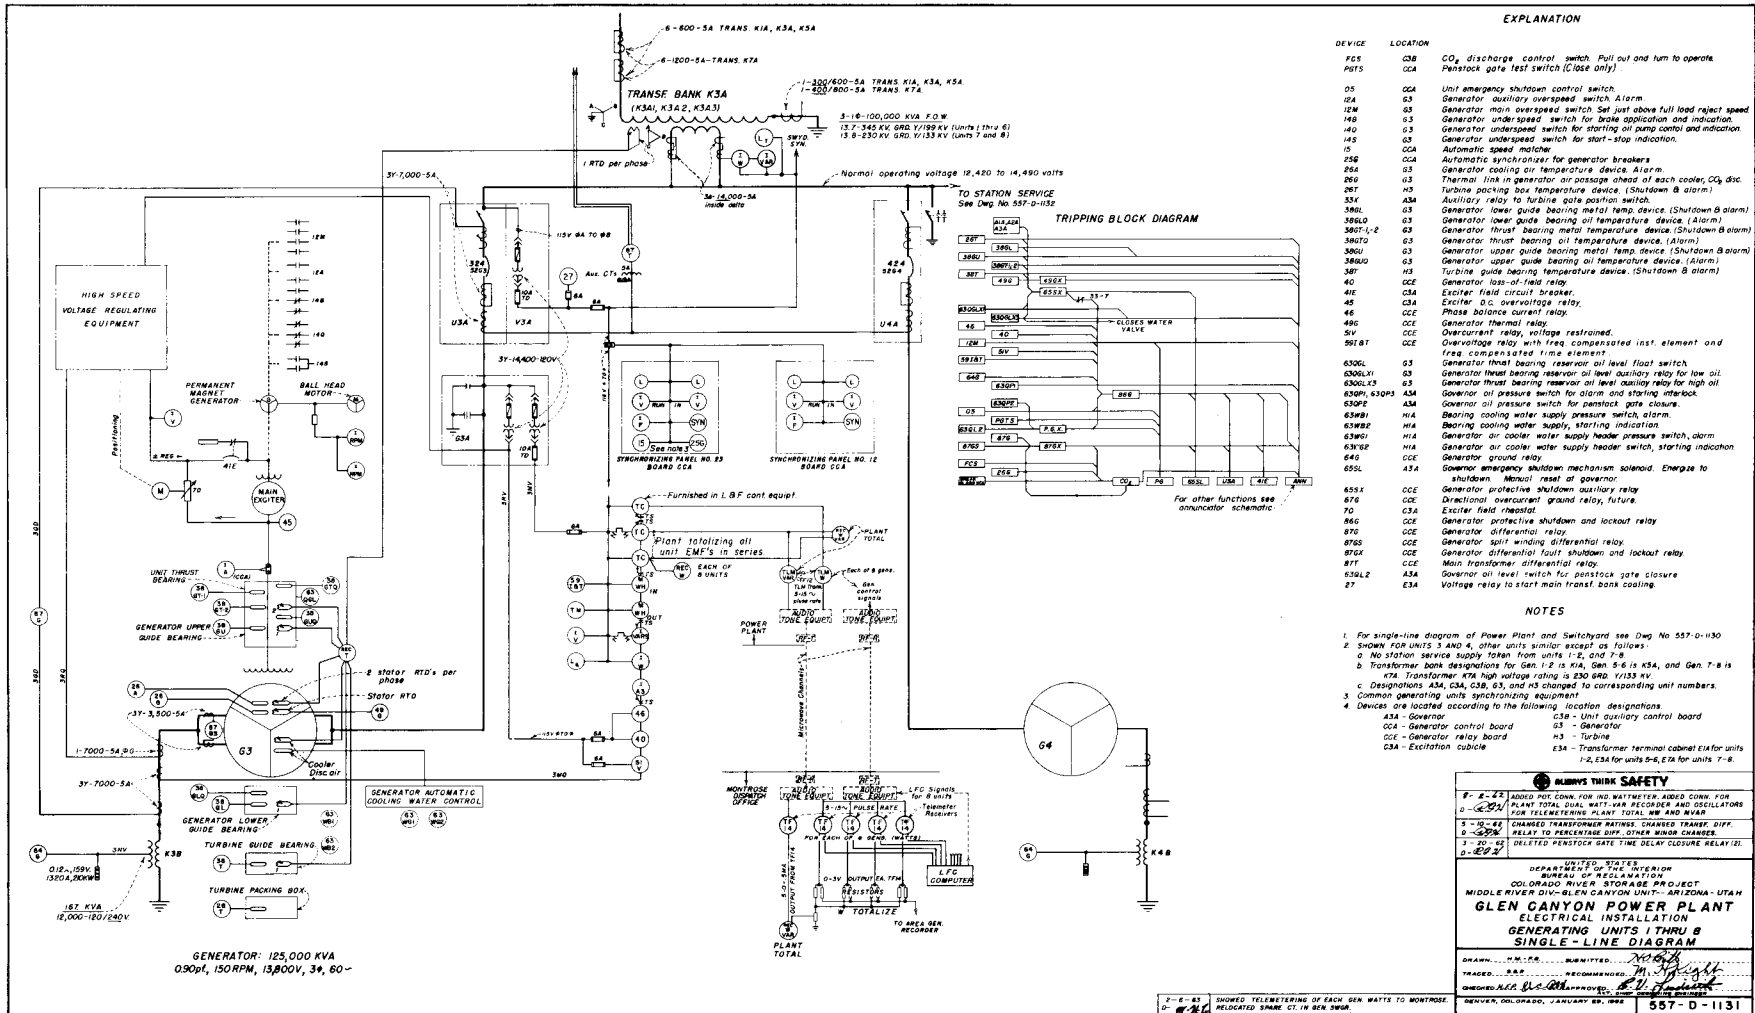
Powerplant electrical installation single-line diagram—Generating units 1 through 8.
